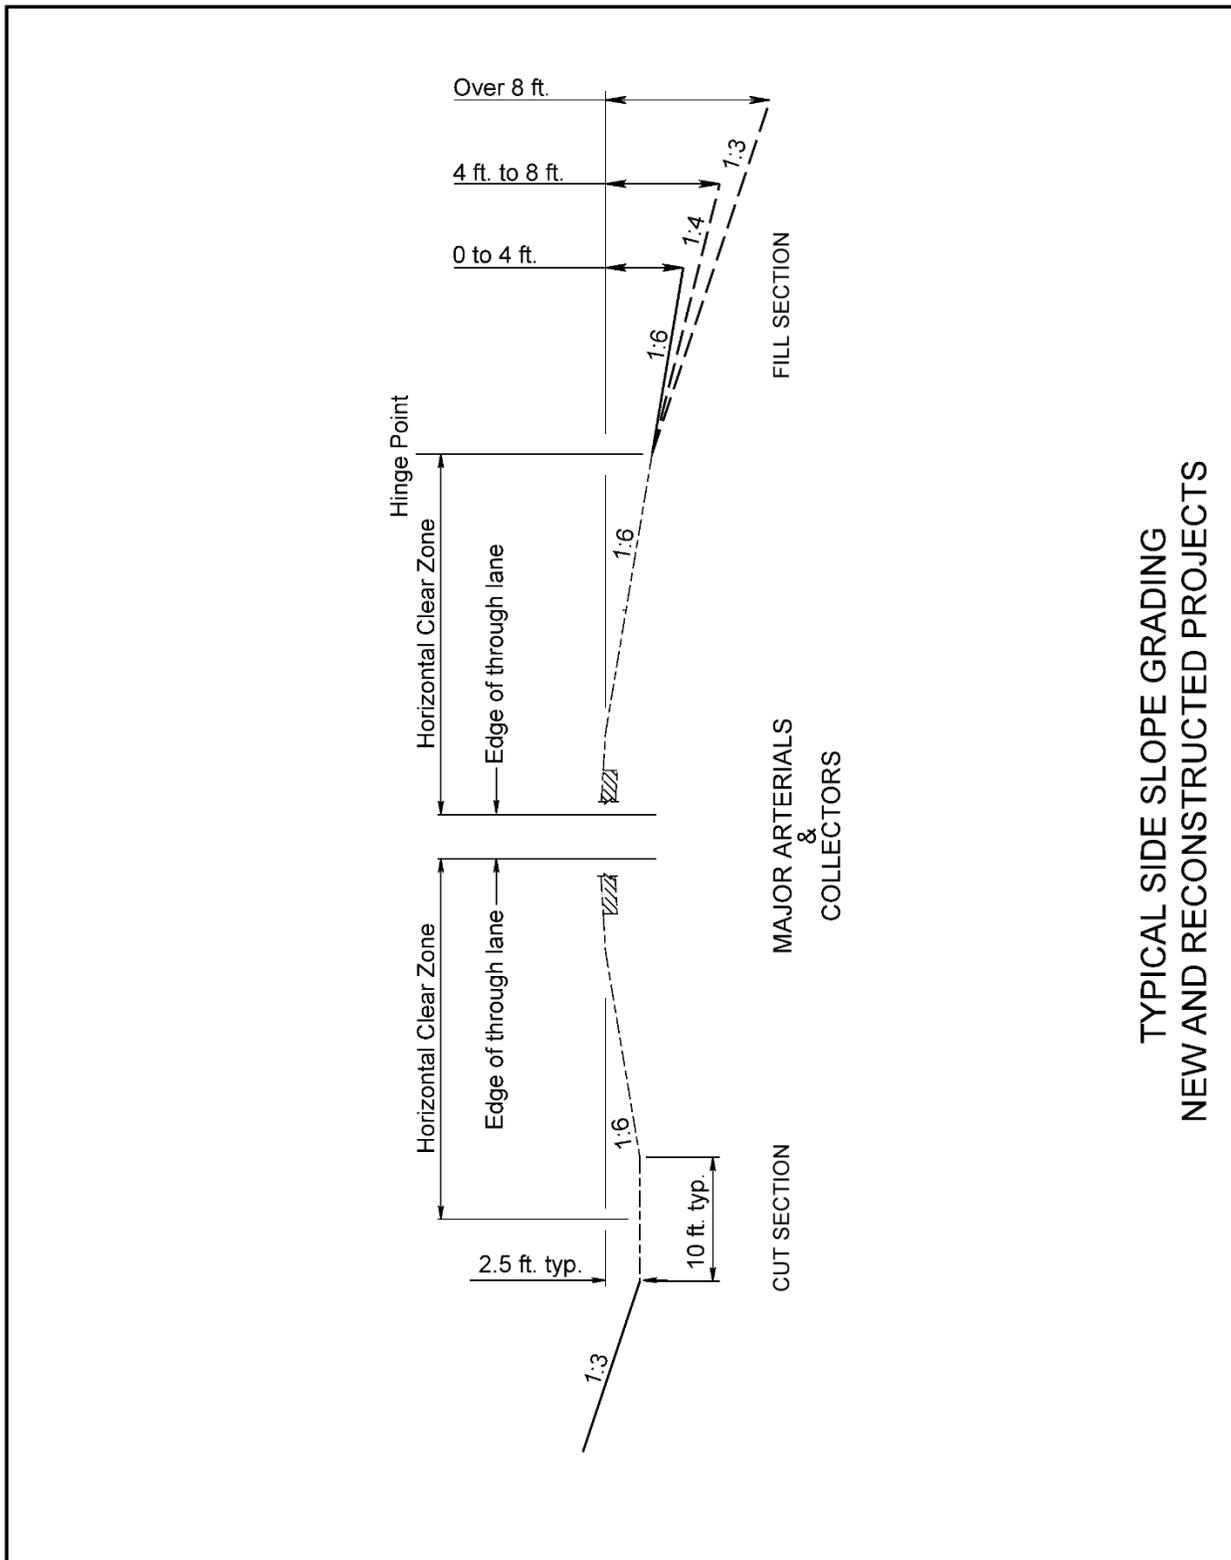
Typical Side Slopes for New and Reconstructed Projects
